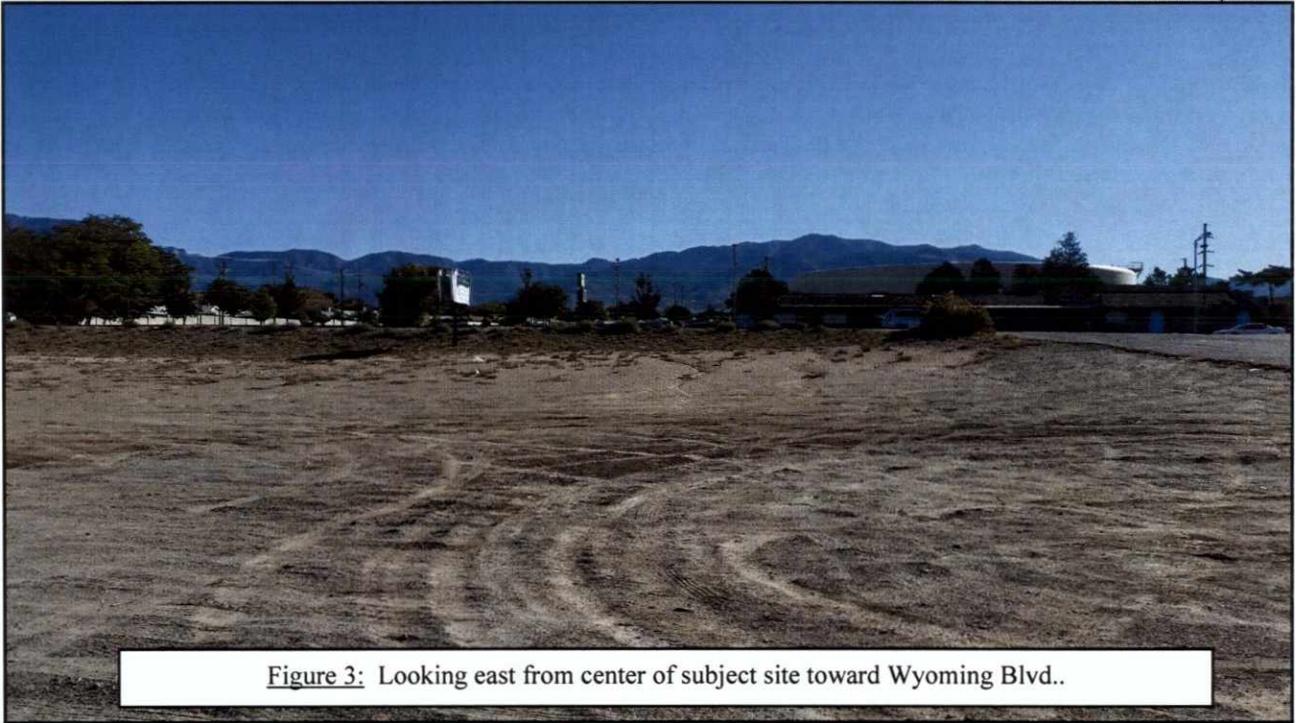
Looking east from center of subject site toward Wyoming Blvd..
